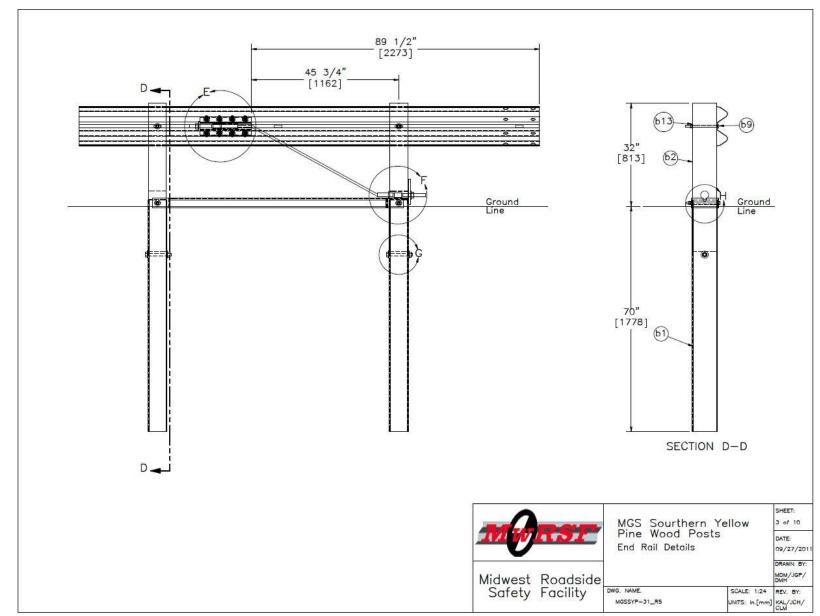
Anchorage Layout, Test No.MGSSYP-1
